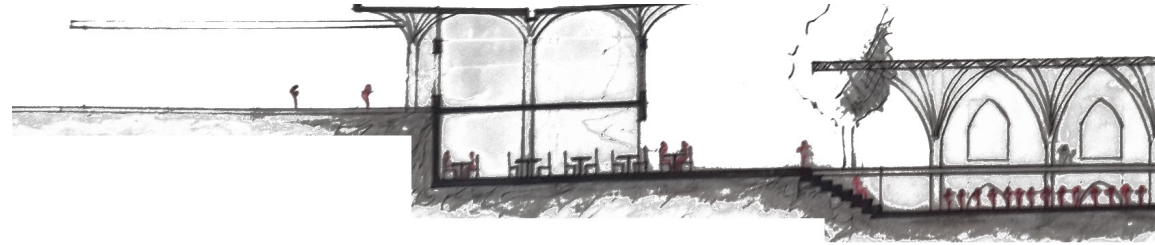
SECTION/ ELEVATION ACROSS ENTIRE SITE
